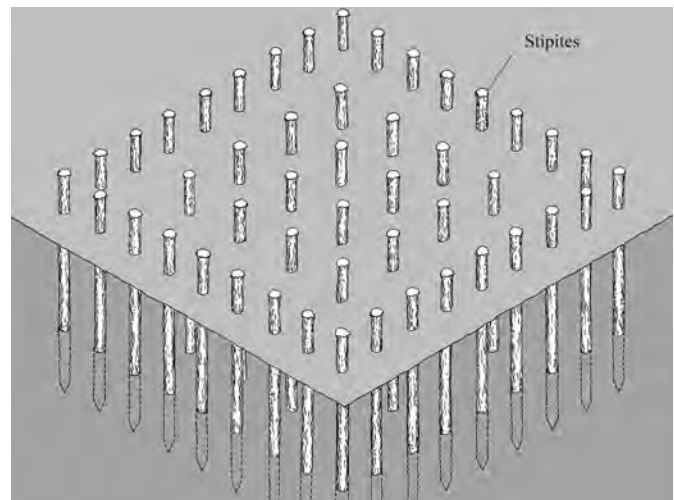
Reconstruction of the outer piles (stipites) installed in the second phase of building a Category 1 form (C. J. Brandon).
